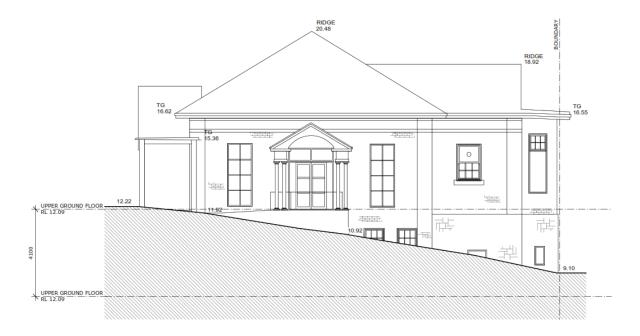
52 Raglan Street West elevation (Building Assets Planning Design and Delivery)
